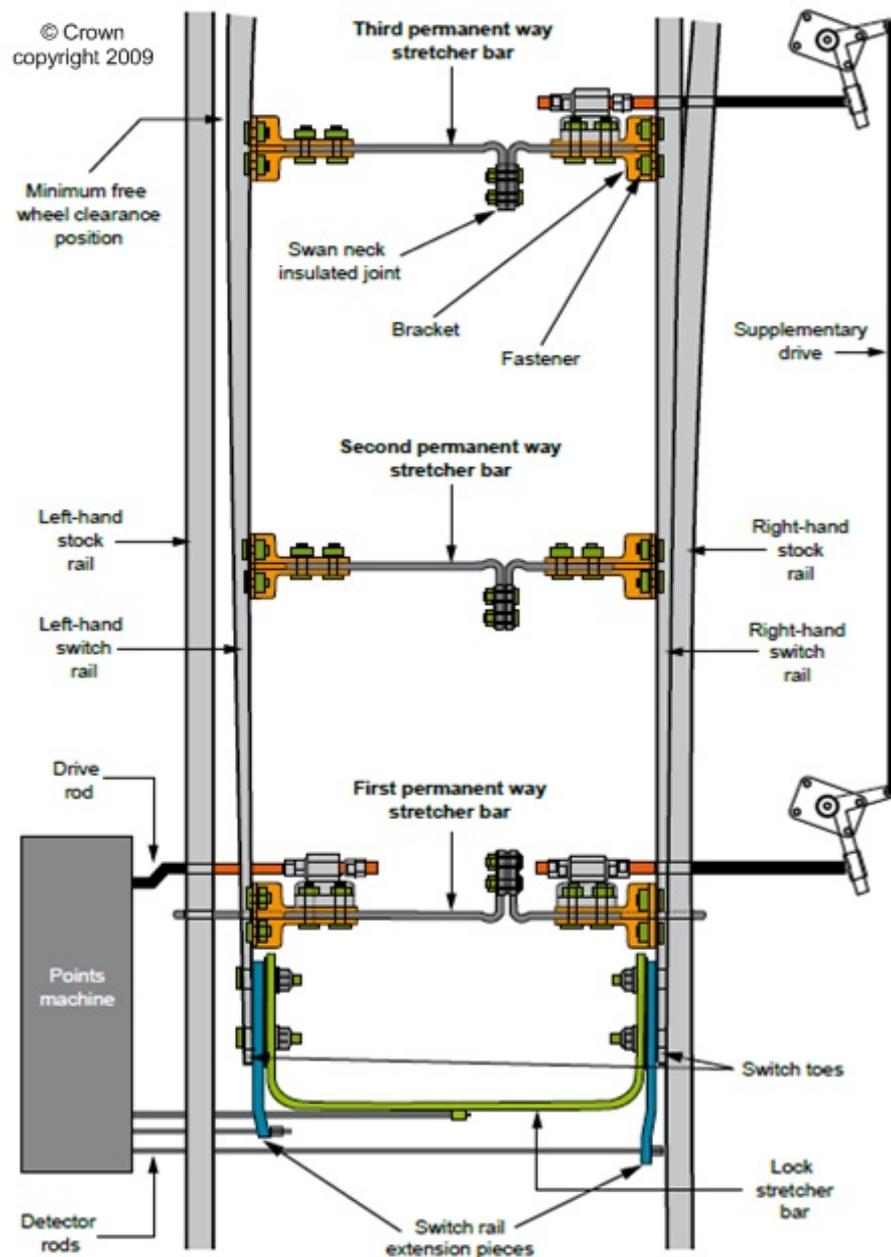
Layout of points showing switch and stock rails and stretcher bars (from RAIB (2011))
